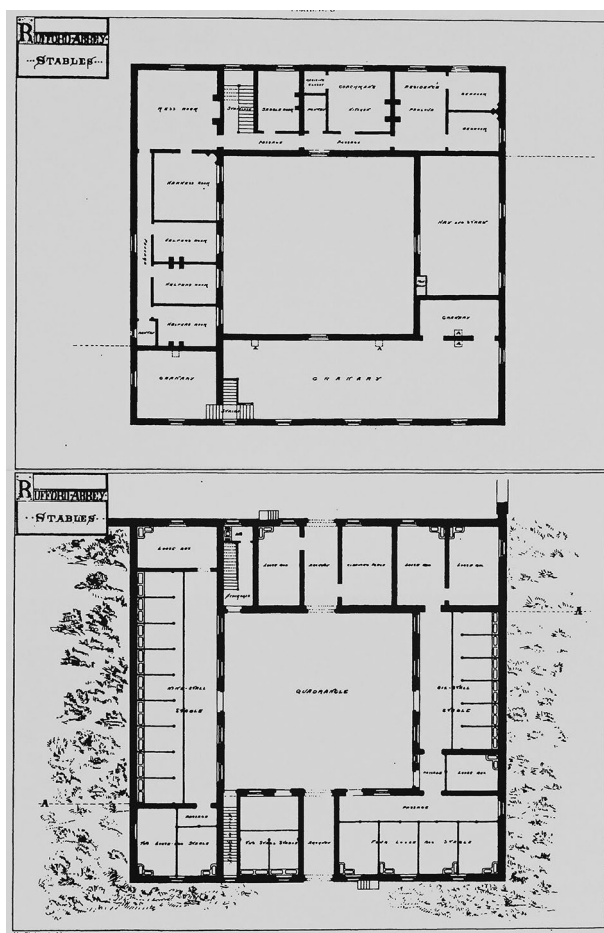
John Birch. Plans of the ground and first floors of the Stableblock at Rufford Abbey from *The Architecture of the Stables and Country Mansions* published in 1883.
